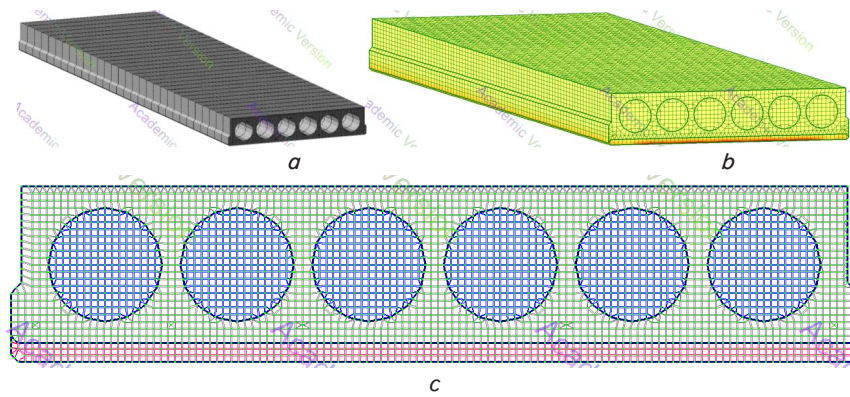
3D model of reinforced concrete ceiling (a, b) and 2D (c) model: a – reinforced concrete ceiling; b – fire-protected reinforced concrete ceiling; c – fire-protected reinforced concrete ceiling
